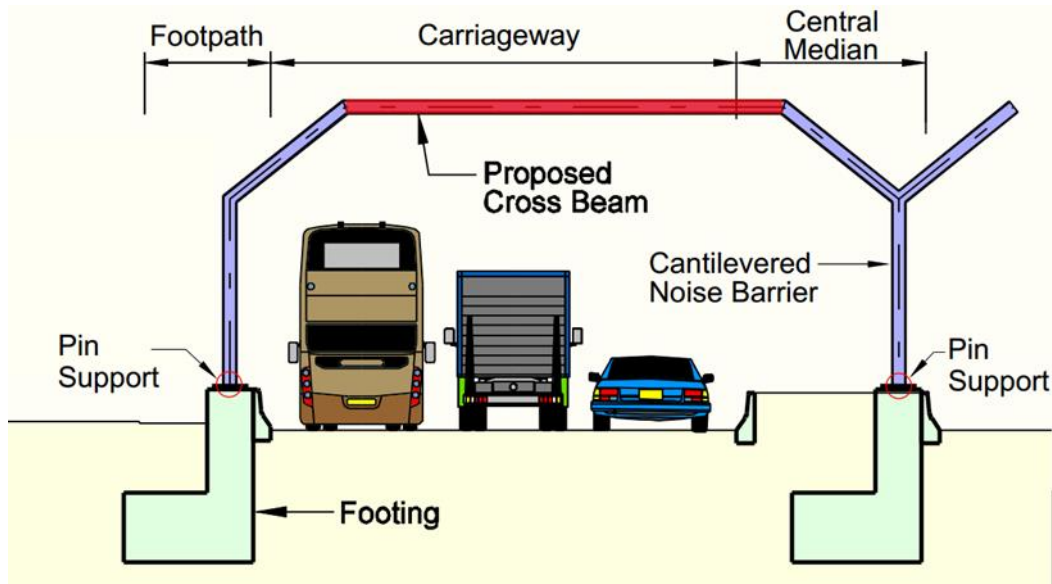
(b) Example of Pin Support at Column Base, at Po Shun Road, Tseung Kwan O
